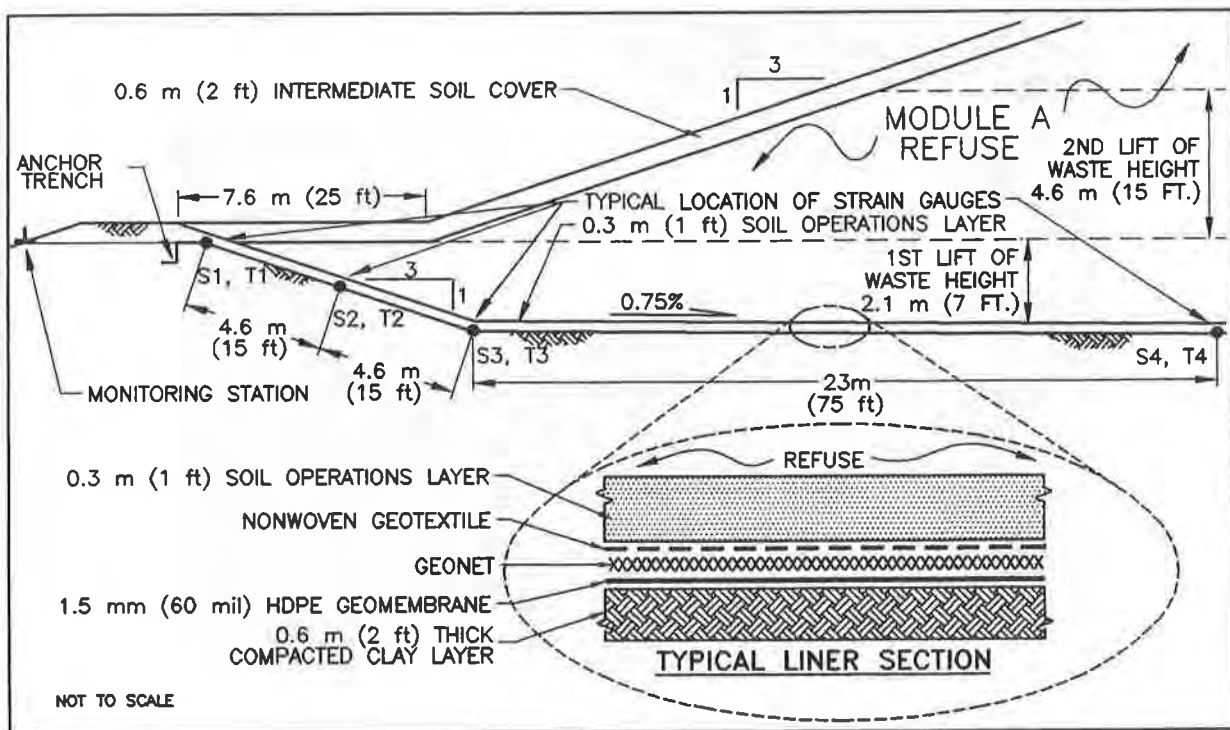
Typical Cross-Section of the Instrumented Landfill Liner System.
